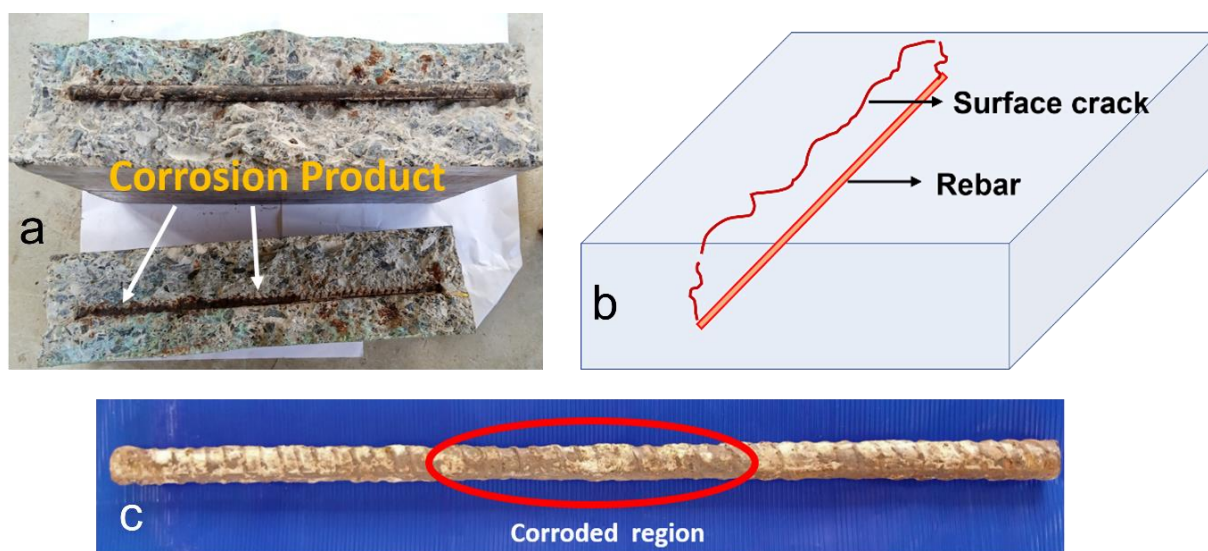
(a) Slab 1 after cracking and during extraction of the rebar; (b) schematic diagram of crack propagation in slab 1; (c) extracted rebar from slab 1.
